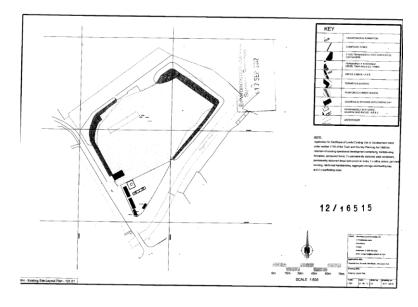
Site Layout Plan (LDC ref. 12/16515/LDE)
